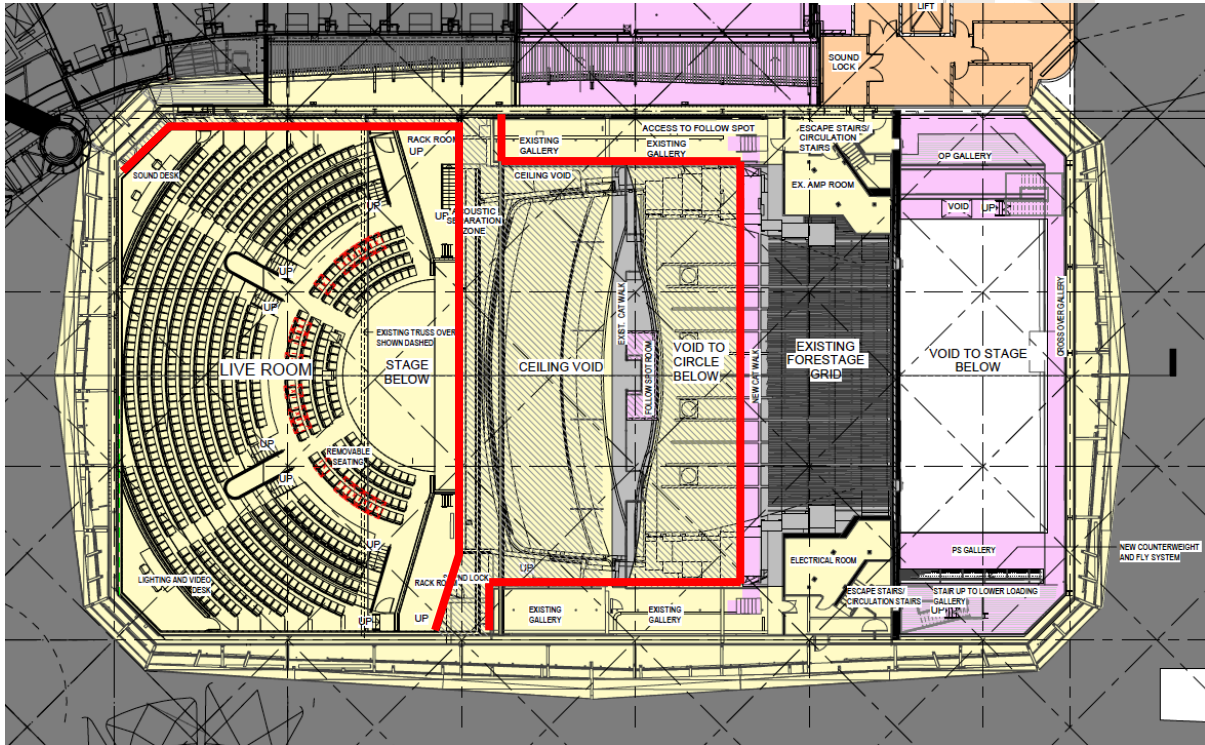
New & Existing Construction – Building Envelope – Insulation Mark Up – Level 6
